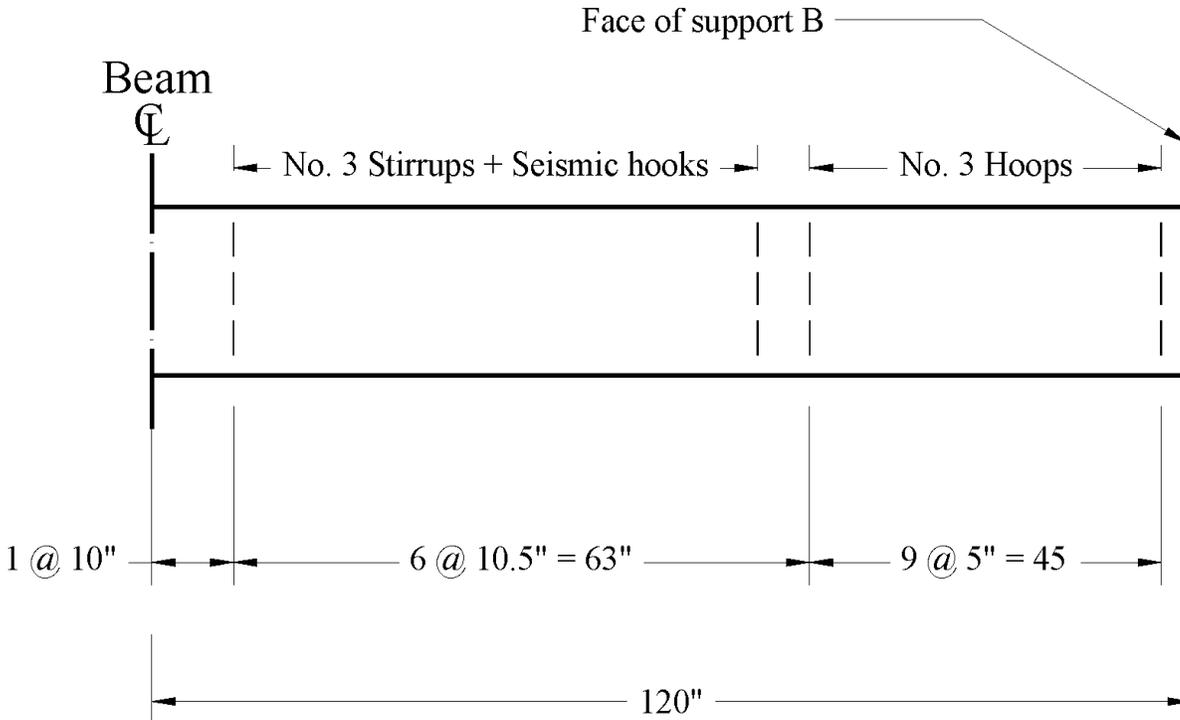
Spacing of hoops and stirrups in right half of beam AB
